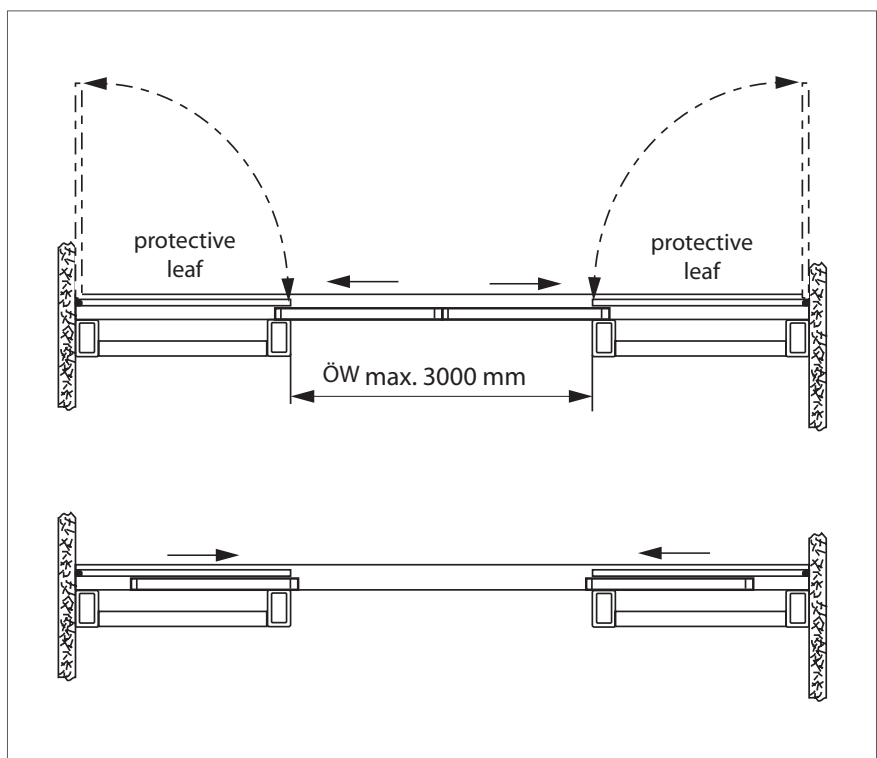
· Façade construction installation, double-leaf version, with protective leaf
